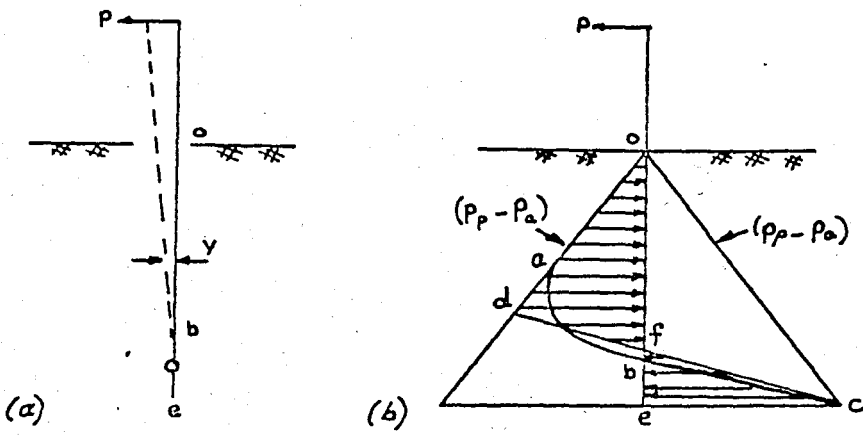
Earth Pressure on Cantilever Sheet Piling (after Teng, 1975).
